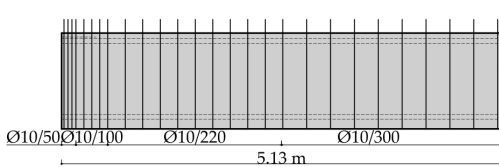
Geometry and reinforcement details of the prestressed beam set 2.
